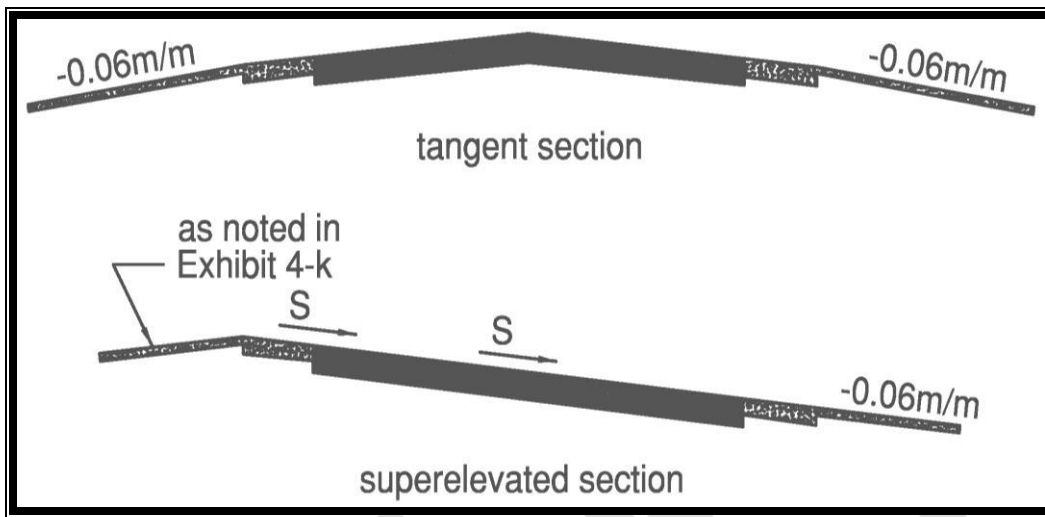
Shoulder Cross Slope and Superelevation
